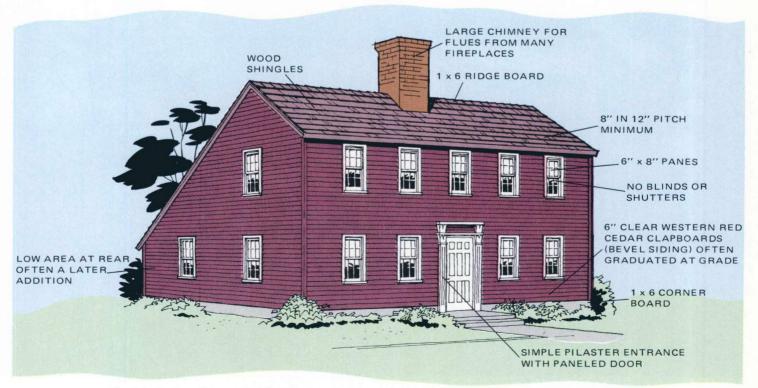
Styling of the original Salt Box home with wood roof shingles, narrow wood siding, and no shutters.
